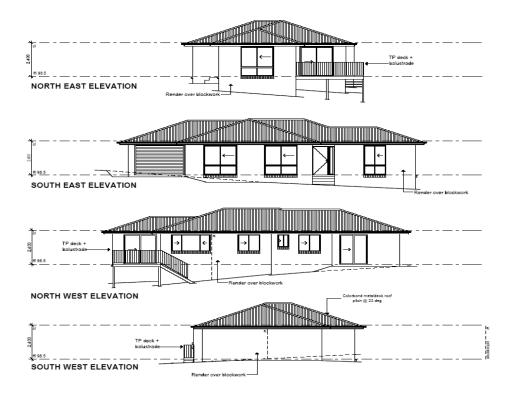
Elevation drawings of the test house (Source: Wilson Houses)
